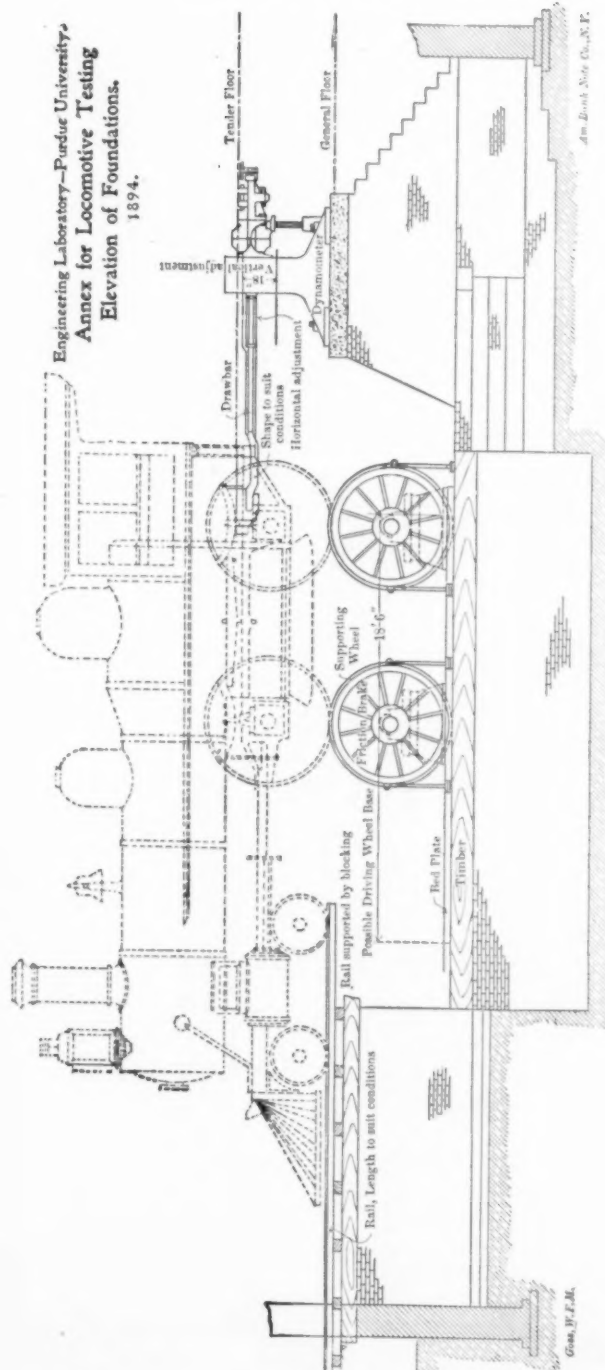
ELEVATION OF THE SECOND PURDUE PLANT.
